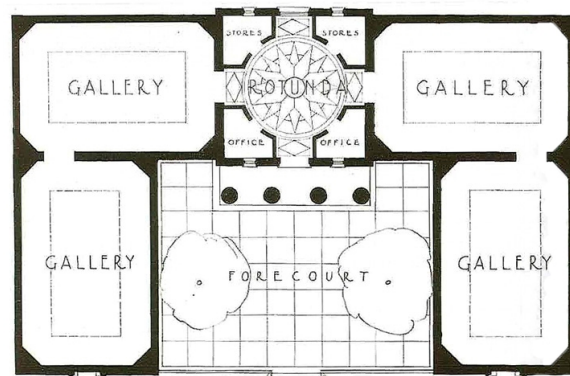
Floorplan of the U.S. Pavilion (1930)
